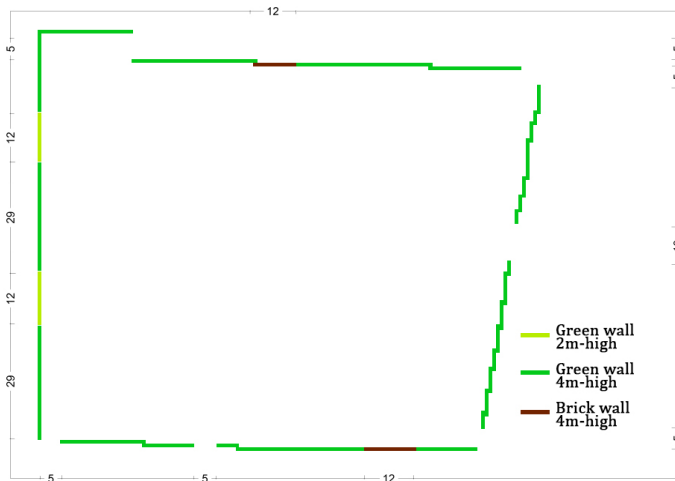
Plan view of modeled enclosure walls alternatives in the contemporary park area
